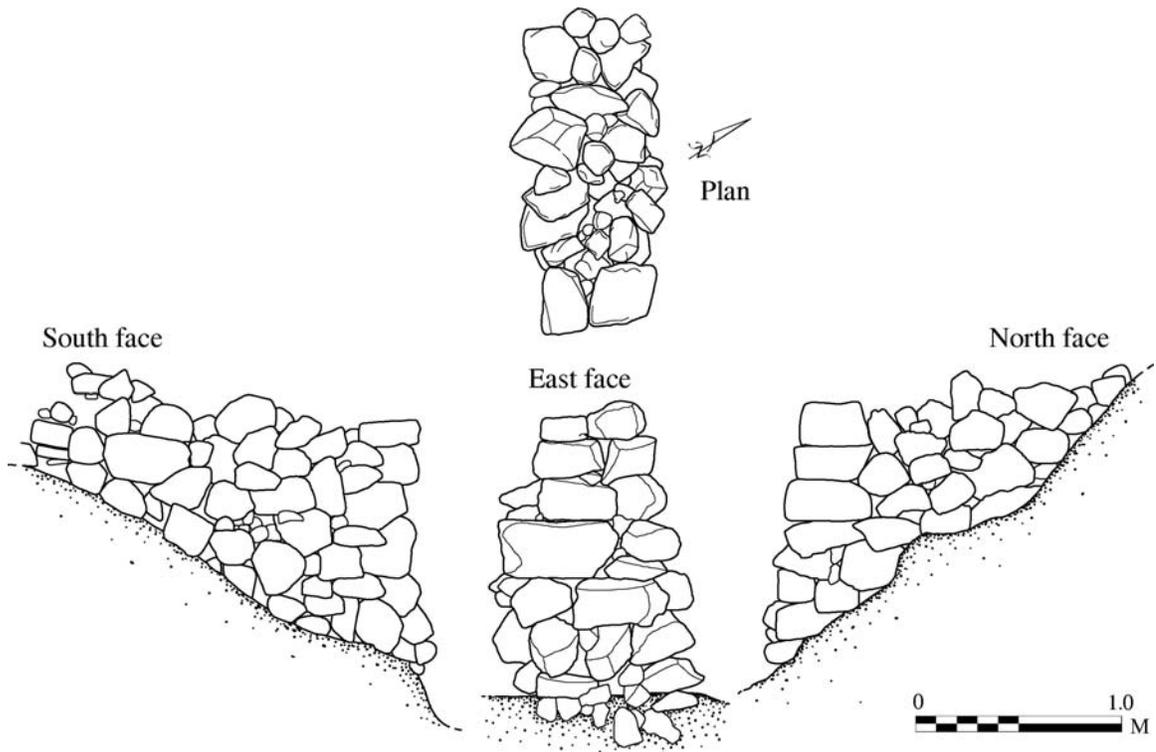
Elevation drawings and plan of Wall 1, Passage 1, Two Owls Area.
